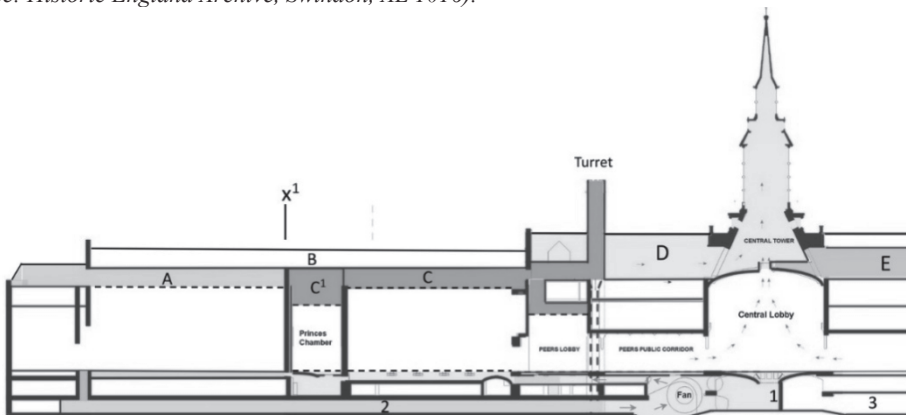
Diagrammatic cross-section showing compartmentation zones at roof level (Source: Author's own drawing).
